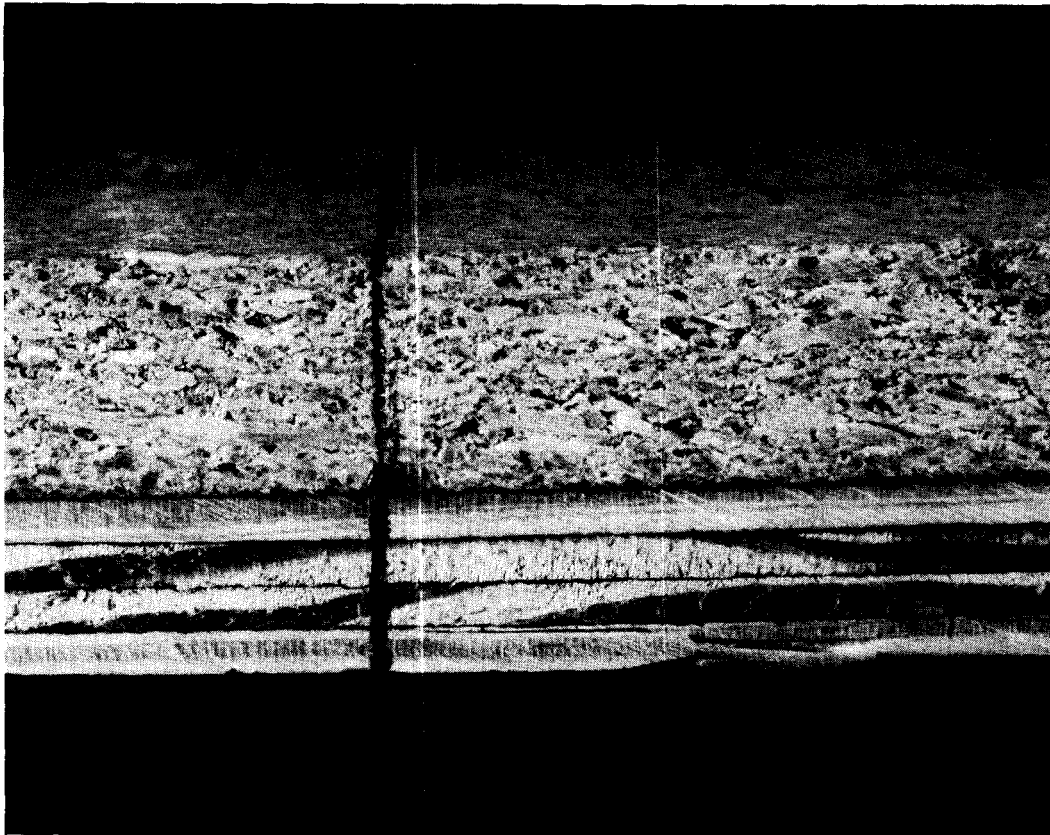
Two-layer floor system consisting of $\frac{1}{2}$ -inch plywood subfloor and $\frac{5}{8}$ -inch particleboard underlayment.
